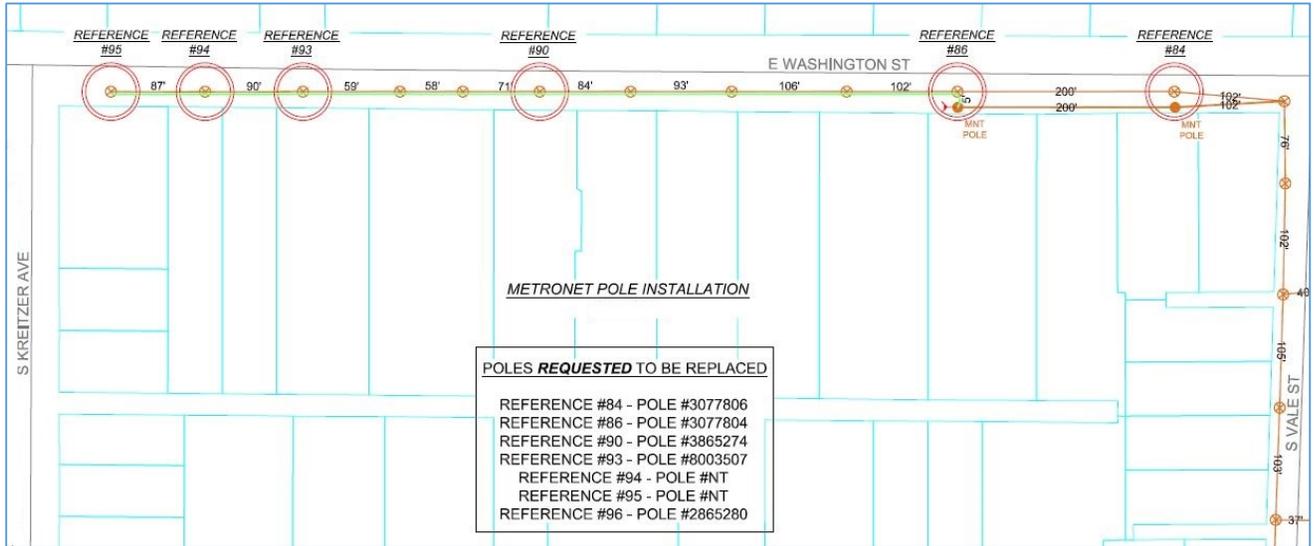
Existing wood utility poles and wires on East Washington Street with 2 new Metronet poles shown as solid filled circles.
